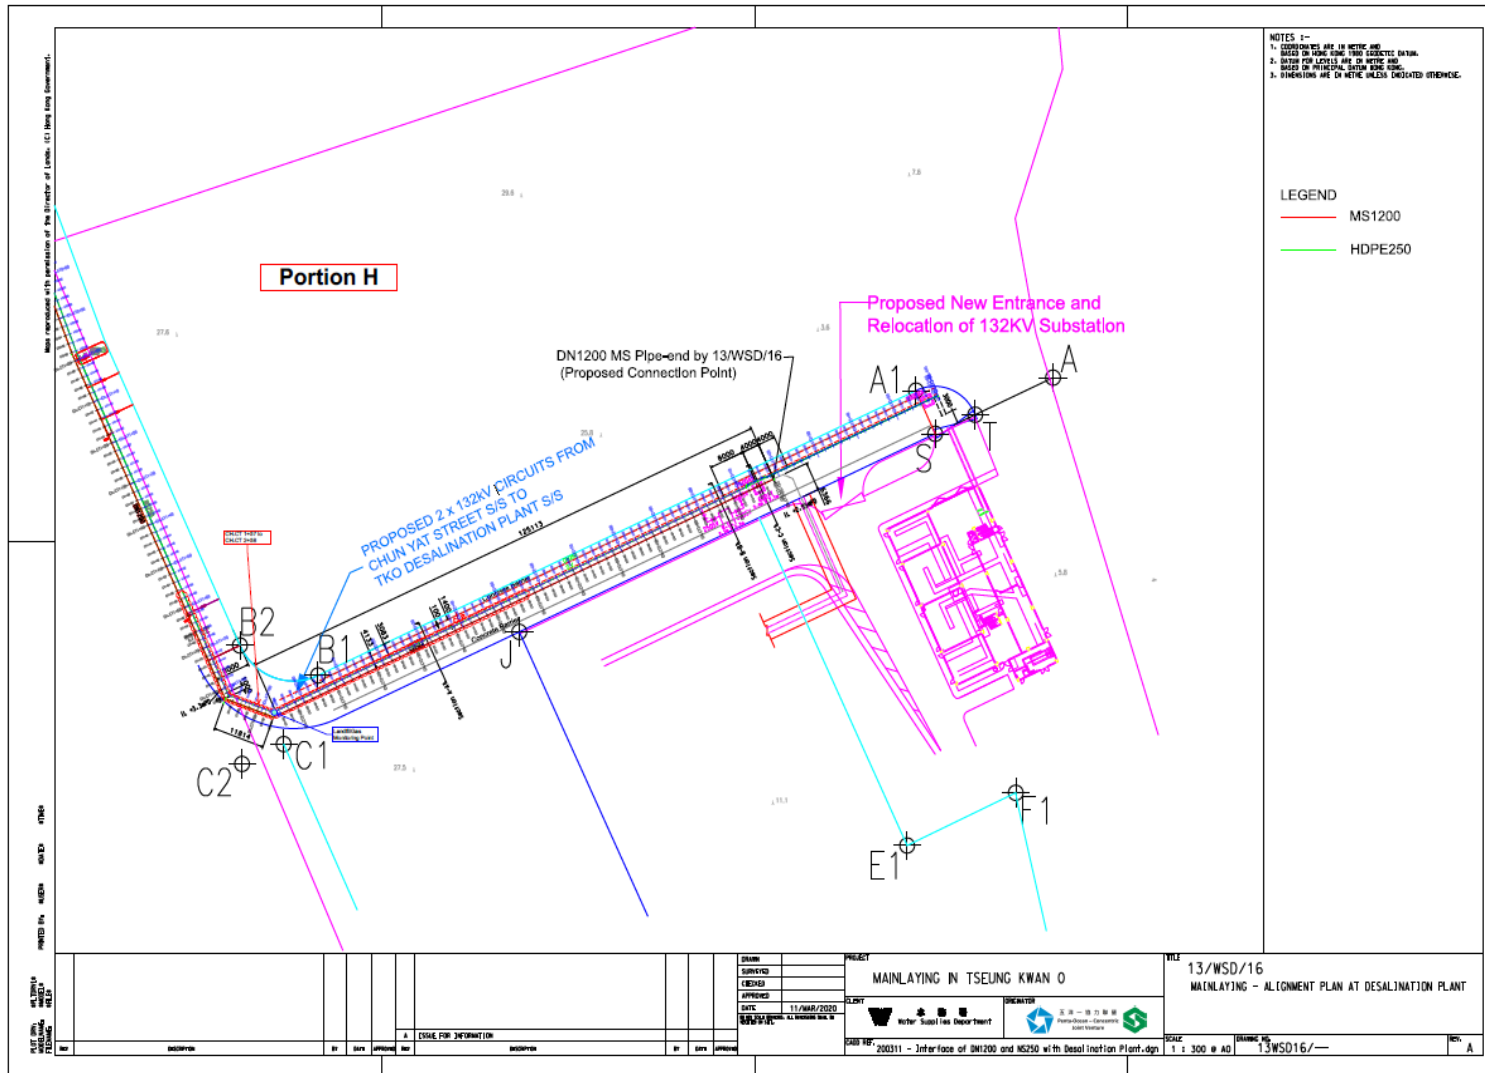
Location Plan for Portion H: CH.CT 0+07 - 2+58
